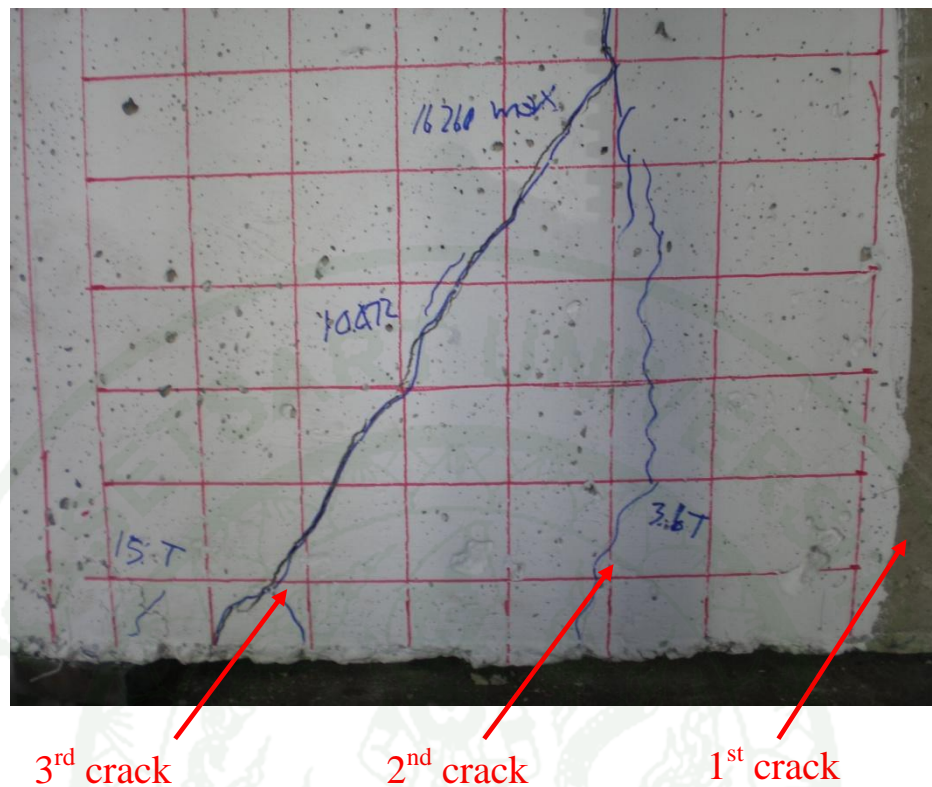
Cracking development of specimen 90° hooked dia 20 mm U-20-240-0.00-H-1/1
